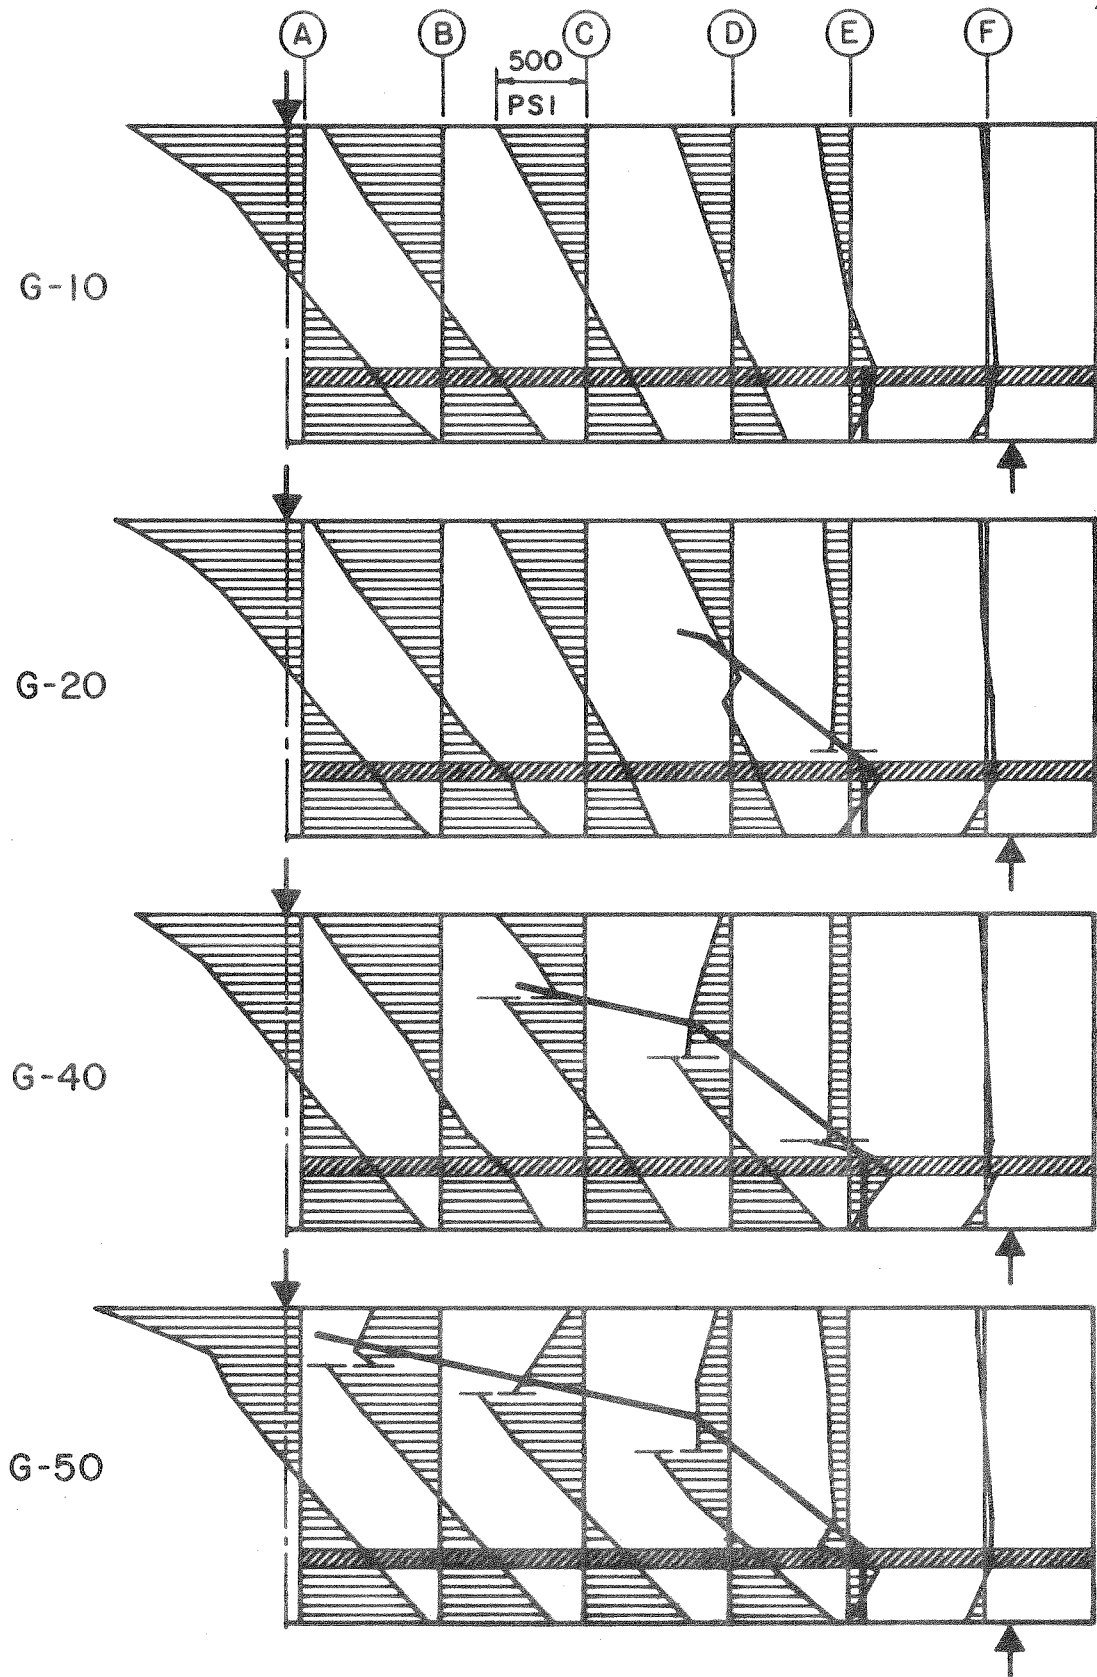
LONGITUDINAL STRESSES IN CONCRETE FOR G-SERIES BEAMS
